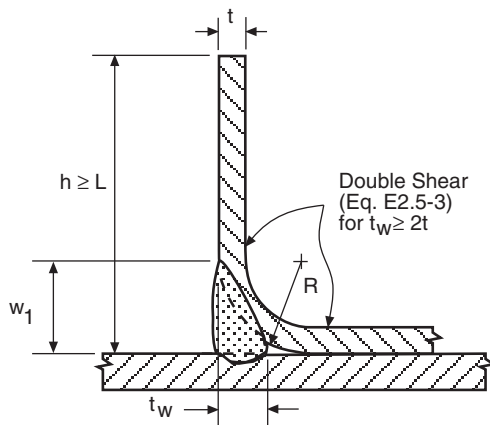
Flare Bevel Groove Weld
